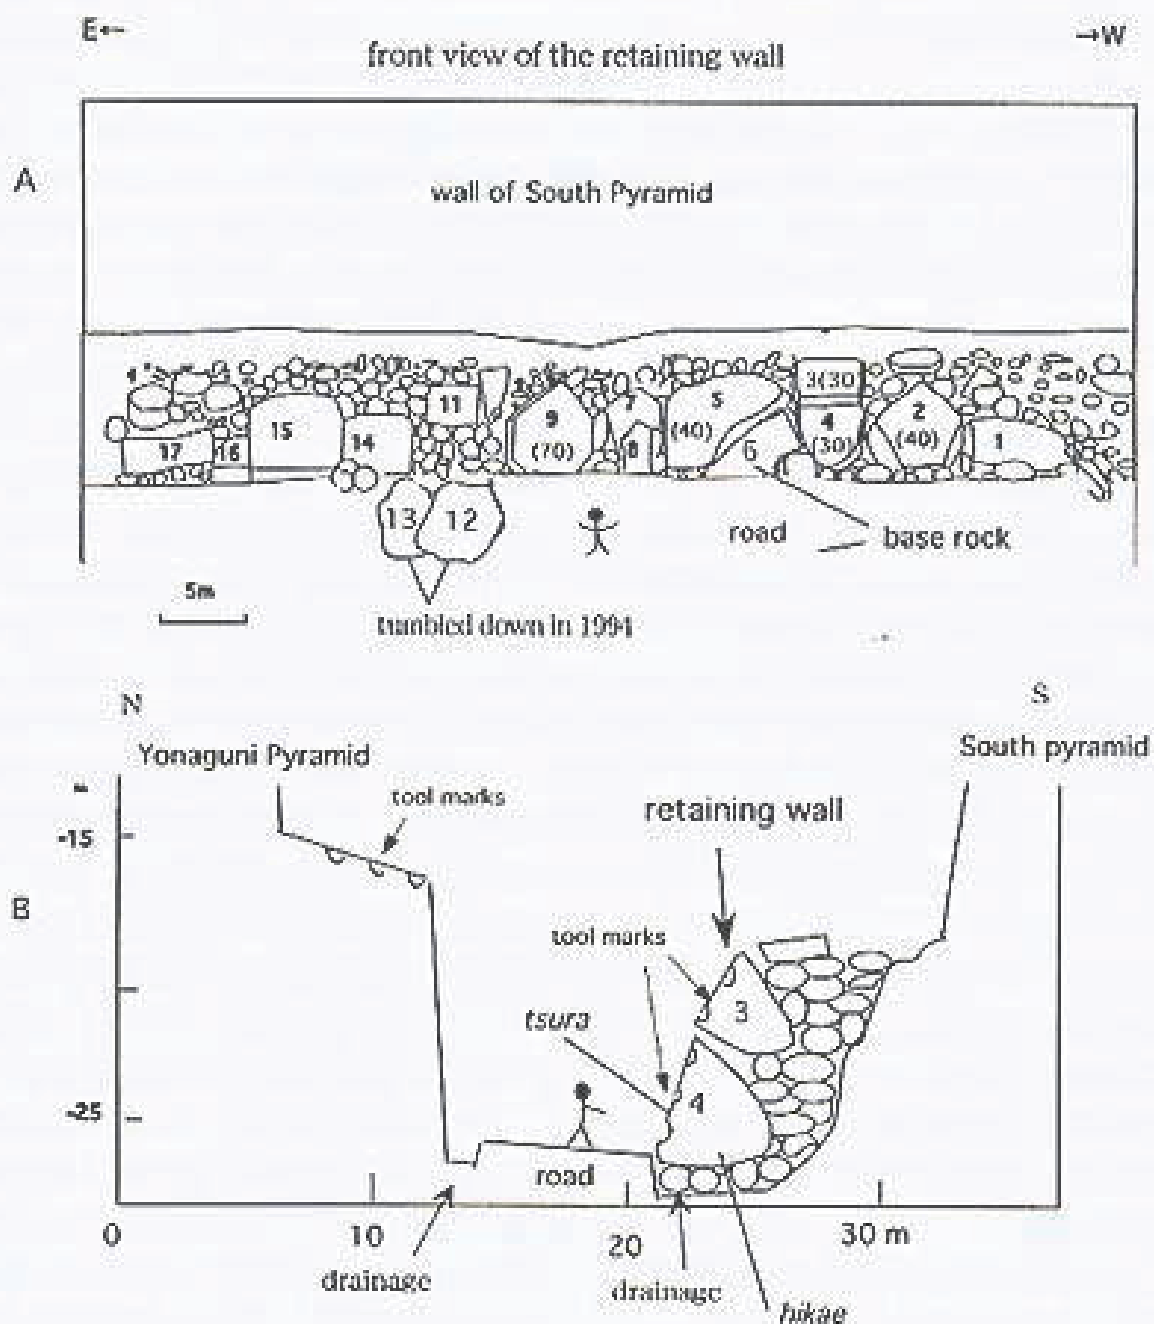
Road and retaining wall system. A: Front view of the wall, numbers on huge rocks are the same in Fig. 9. Number in parenthesis show inclination of the rocks. B: Cross section showing a road, drainage canal and retaining stone wall.
